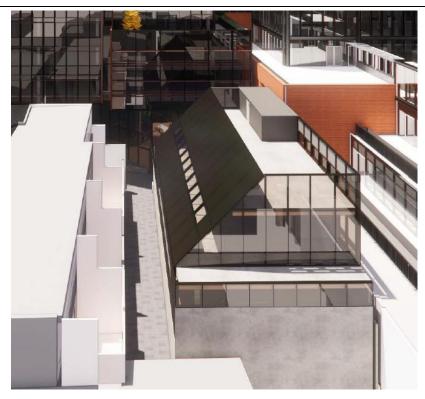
Artistic impression of pavilion as per sketch plans with the existing boundary wall to Nos. 28 – 30 Brighton Street removed for clarity (source: sketch plan package)
